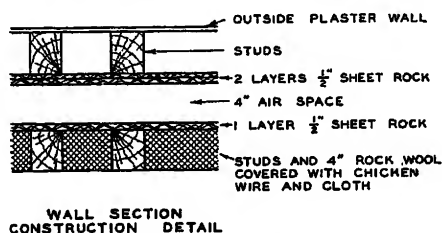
CROSS SECTION OF TYPICAL SOUND STAGE WALL CONSTRUCTION
